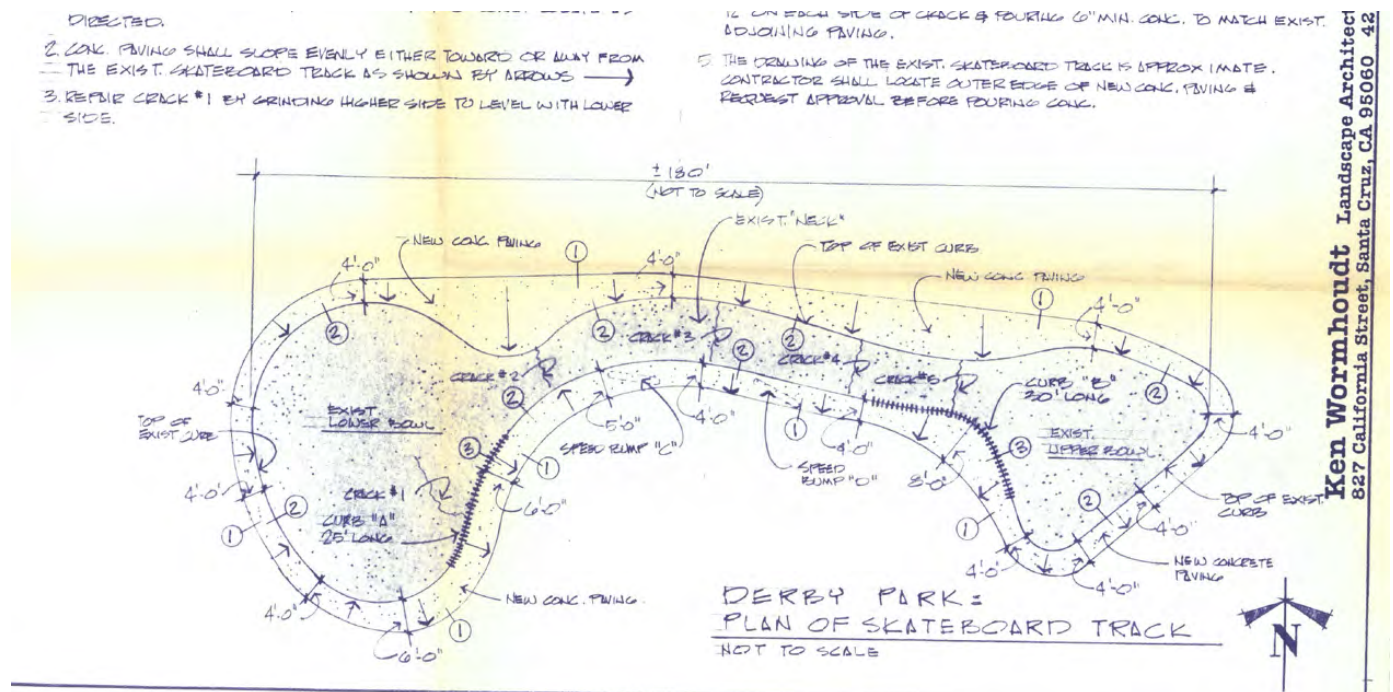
1991 Ken Wormhoudt maintenance plan with proposed repair and sidewalk addition (Wormhoudt Inc. files)
